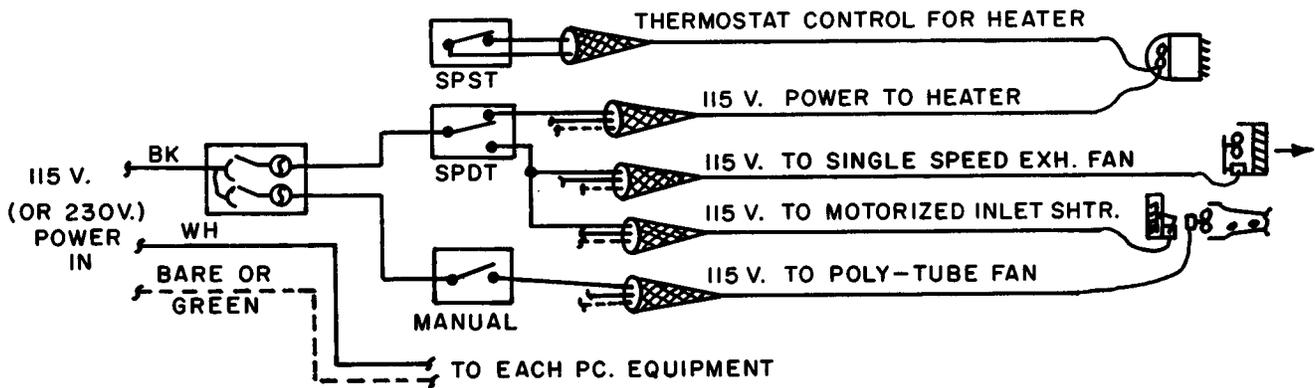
Wiring for a poly-tube heating ventilation system with one heater, one motorized inlet shutter, and a single-speed exhaust fan.
